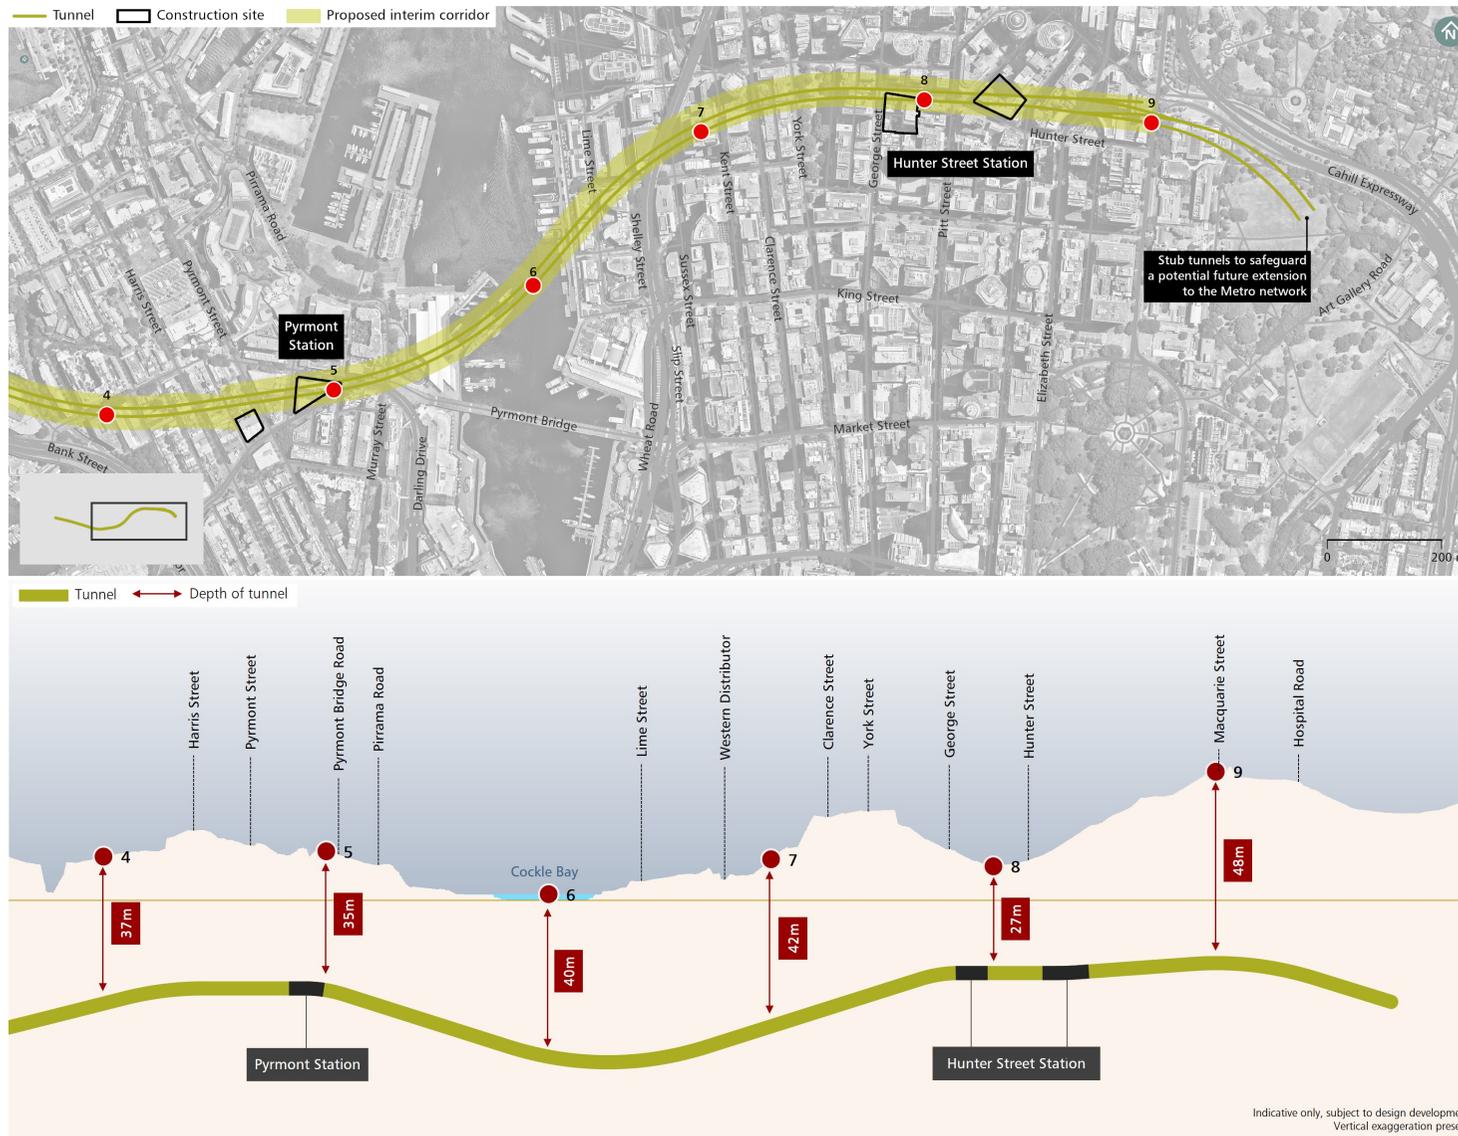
Indicative alignment plan and long section of tunnel (Page 2)
